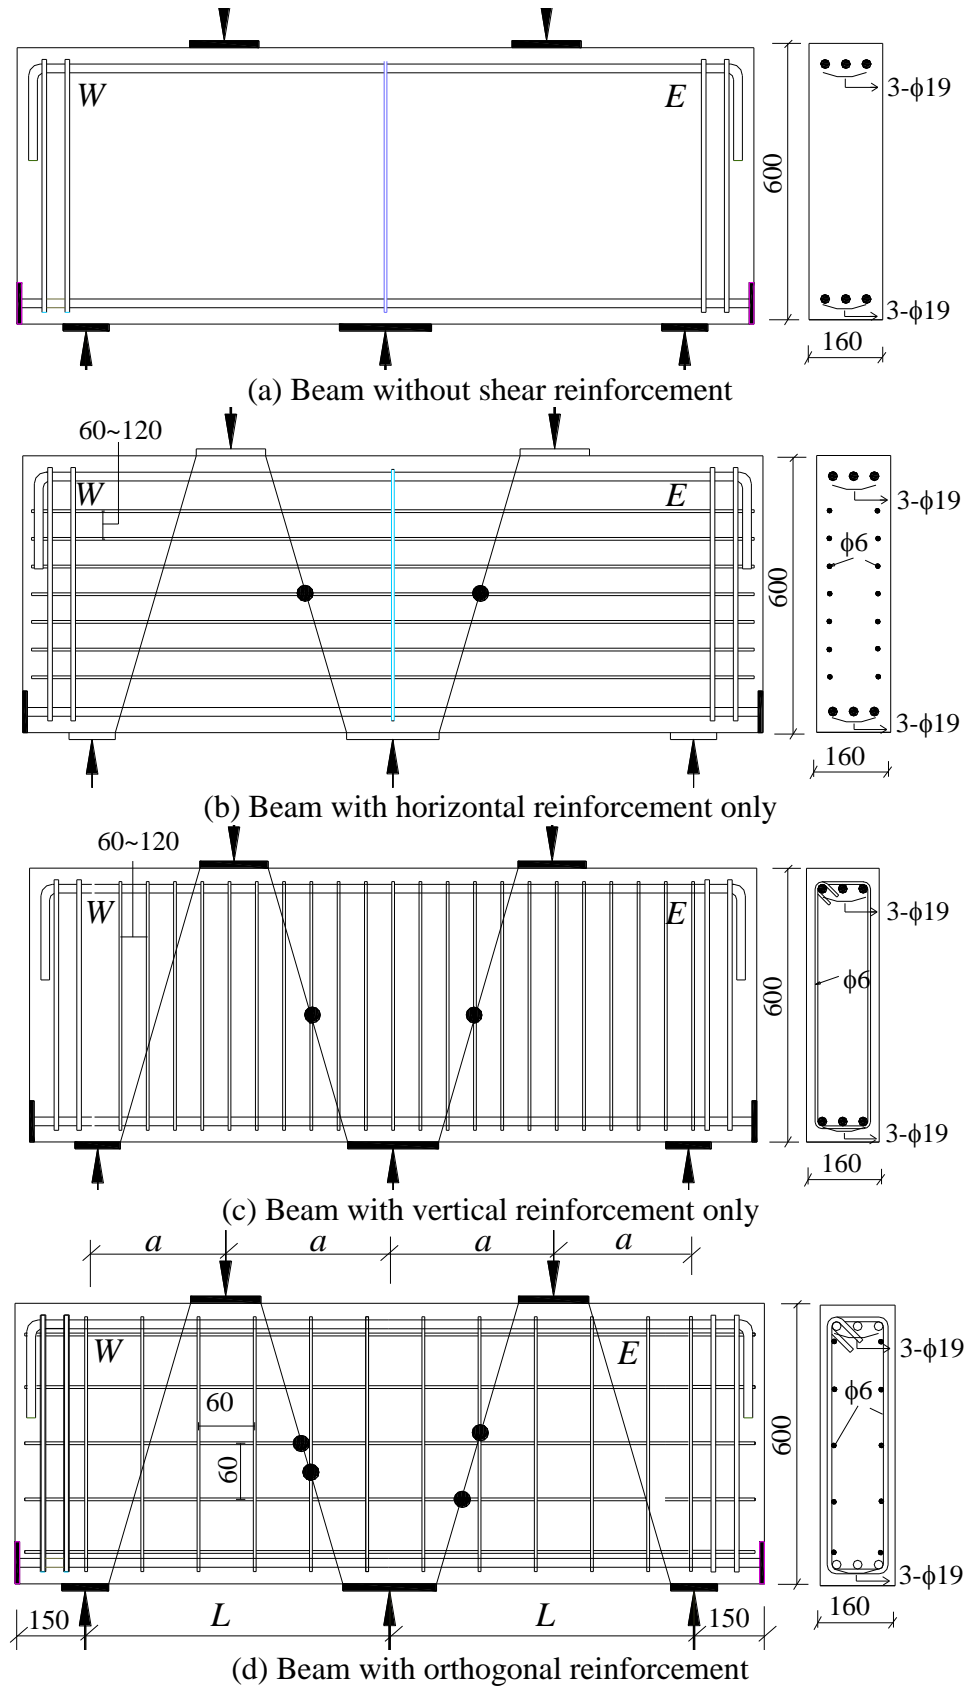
Geometrical dimensions and reinforcement of test specimens.
